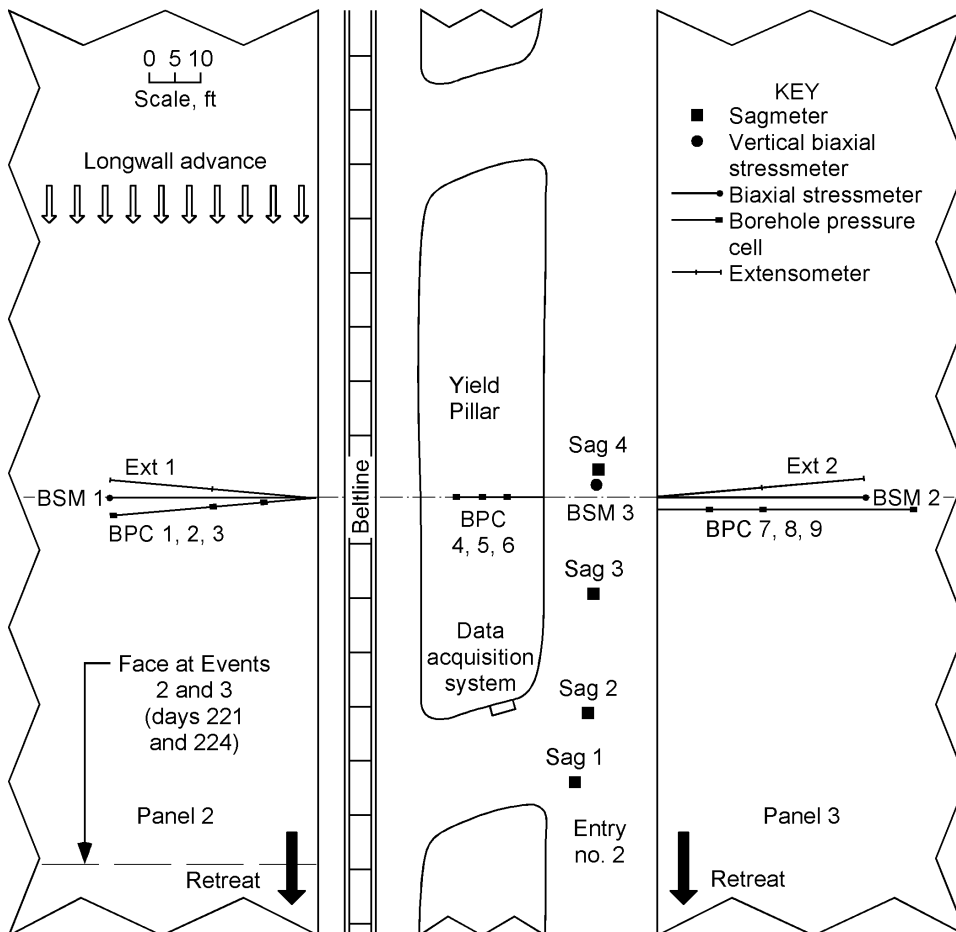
Plan view of monitoring system with instrument layout with BSM 3, mine A
